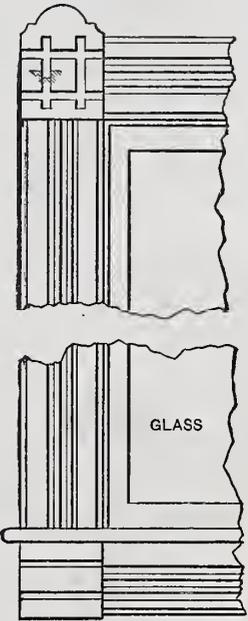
Detail of Inside Window Trimming.—Scale, 1/2 Inch to the Foot.
